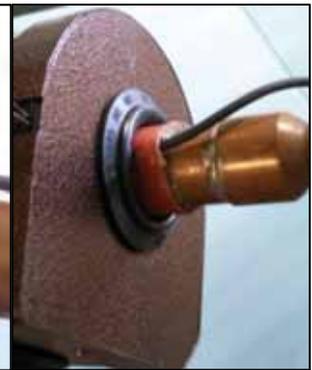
Sensor installed between header and heat shield (sensor wire must be secured to piping and have a high-temperature coating)
